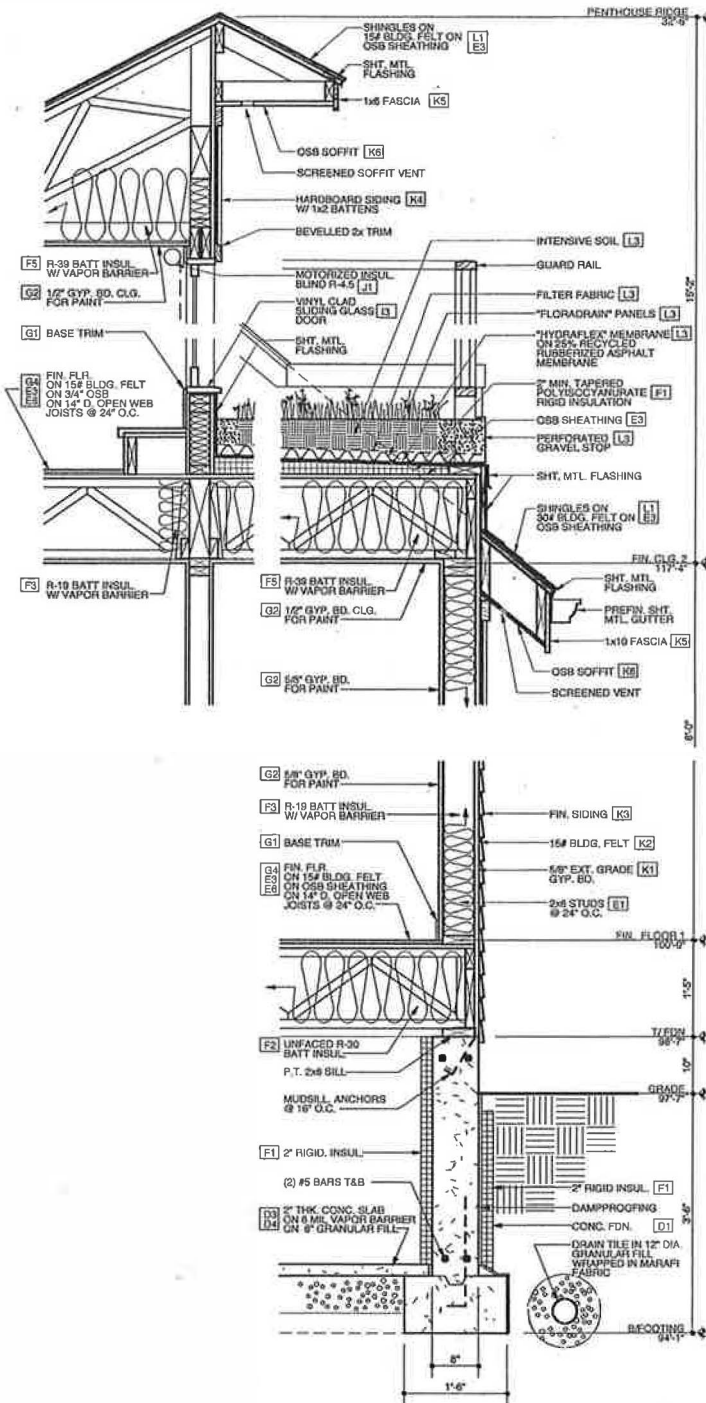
Details of the crawlspace and penthouse/roof garden (with second floor detail omitted). The insulation and waterproofing system for the garden is designed and manufactured by American Hydrotech (Chicago, Illinois).
